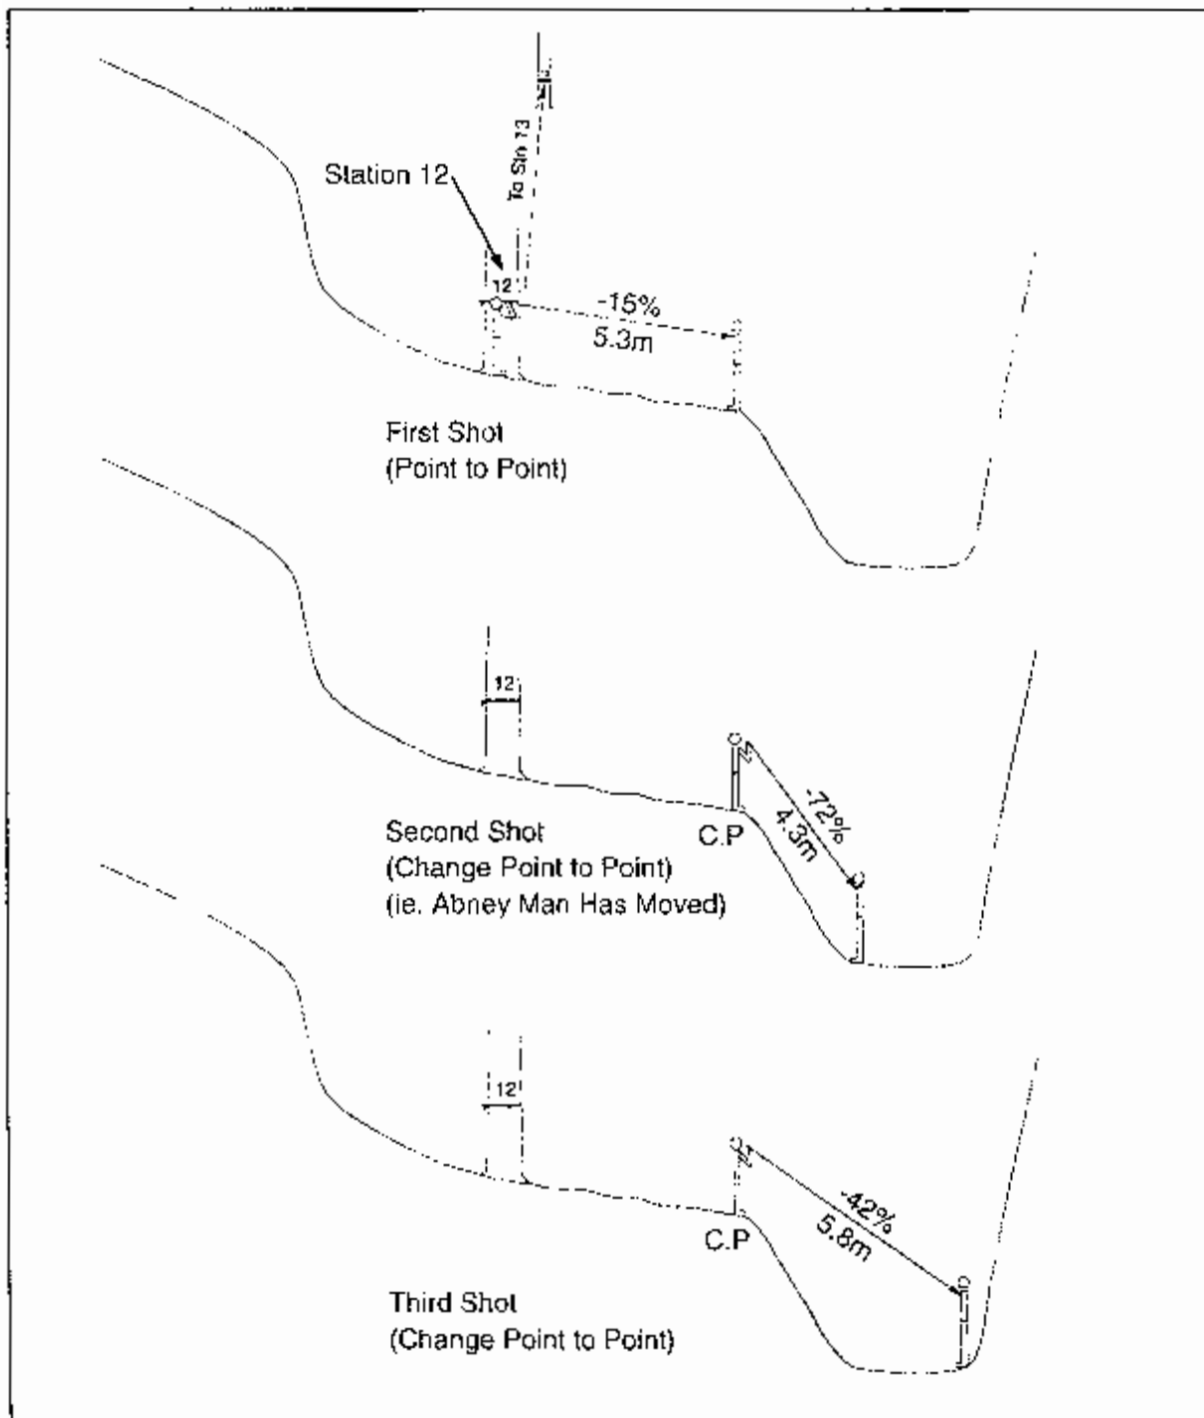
Measuring the slope and slope distance for RHS (Right Hand Side) cross-section
